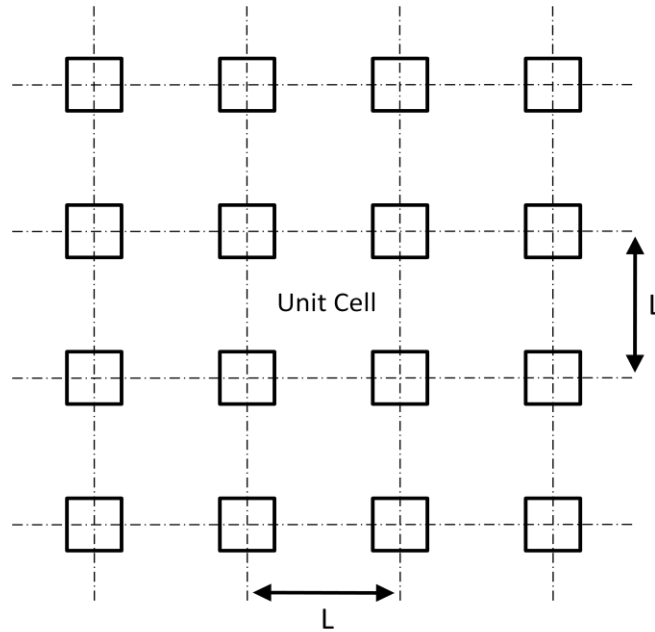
Typical Column Layout Emphasizing a Unit Cell
